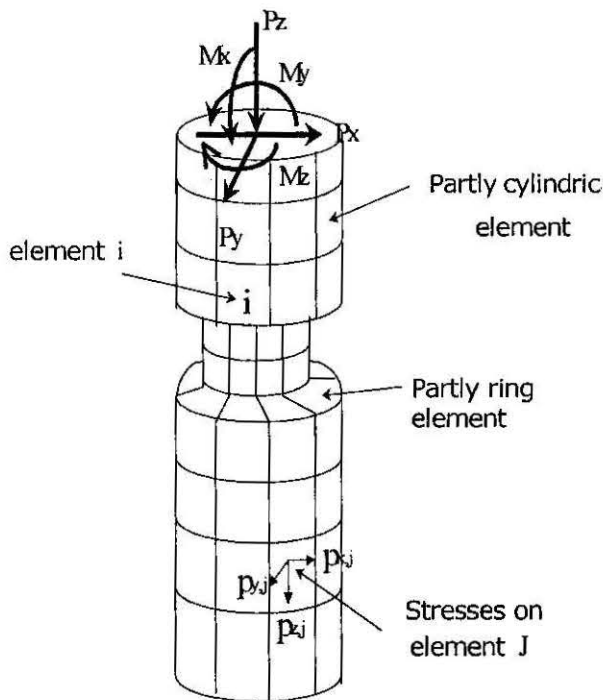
Schematic Diagram showing 3D Boundary Element Discretization, and Loads and Stresses Acting on the Pile on adjacent piles.
